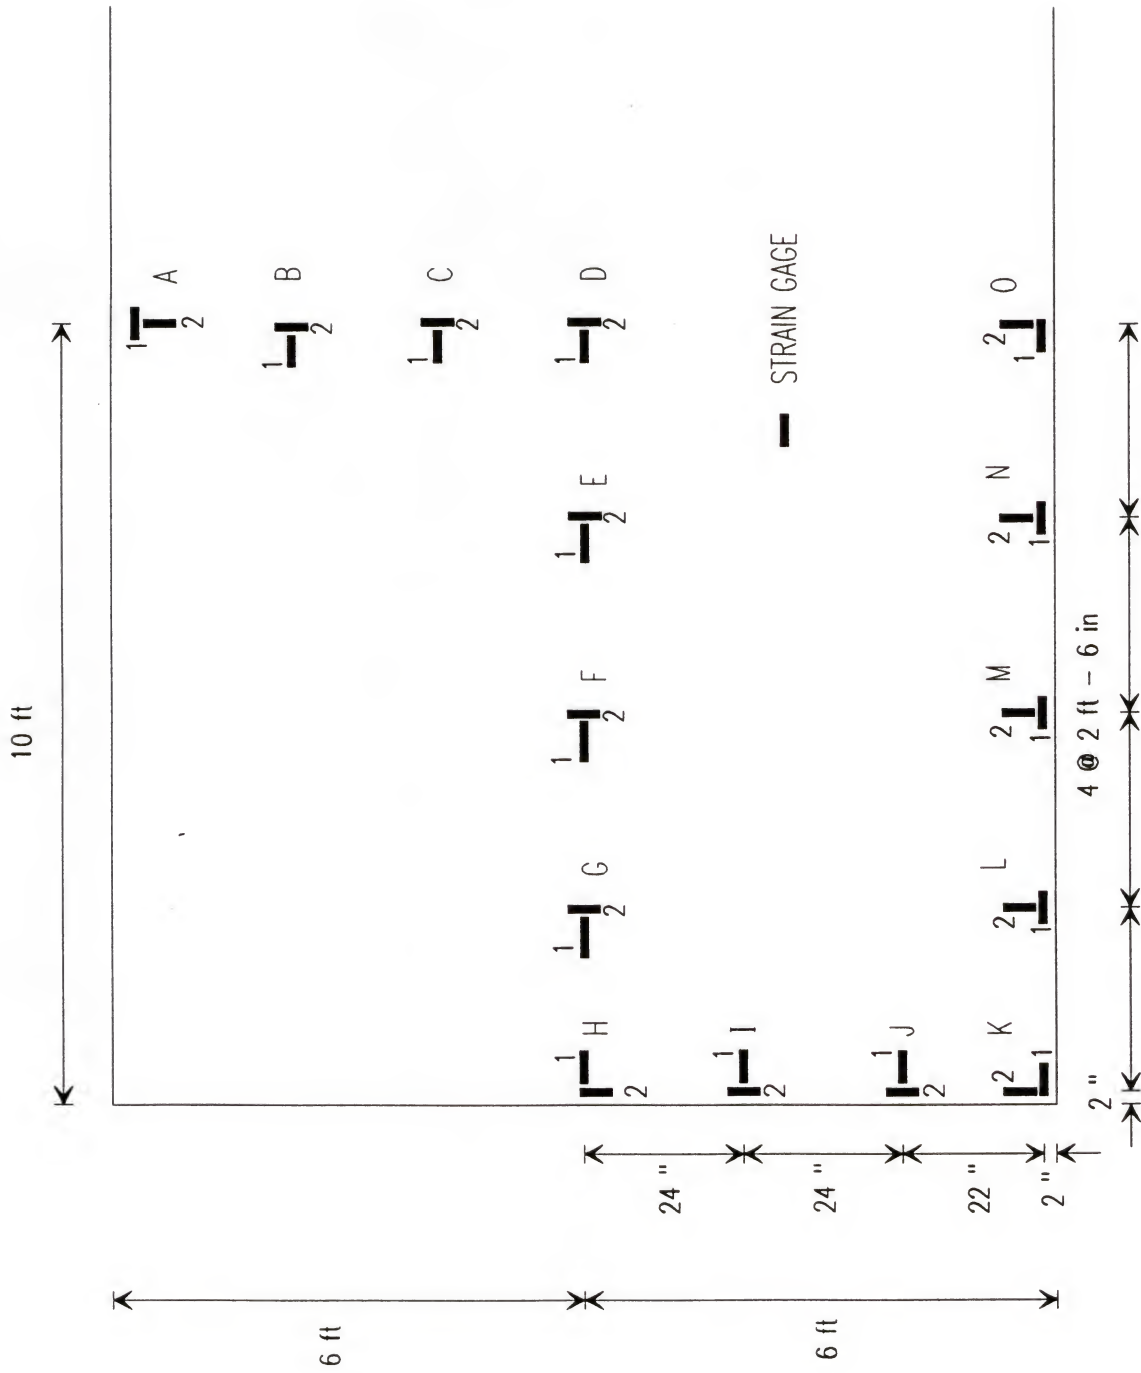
Strain Gages Layout Used in July 1988 Field Test
